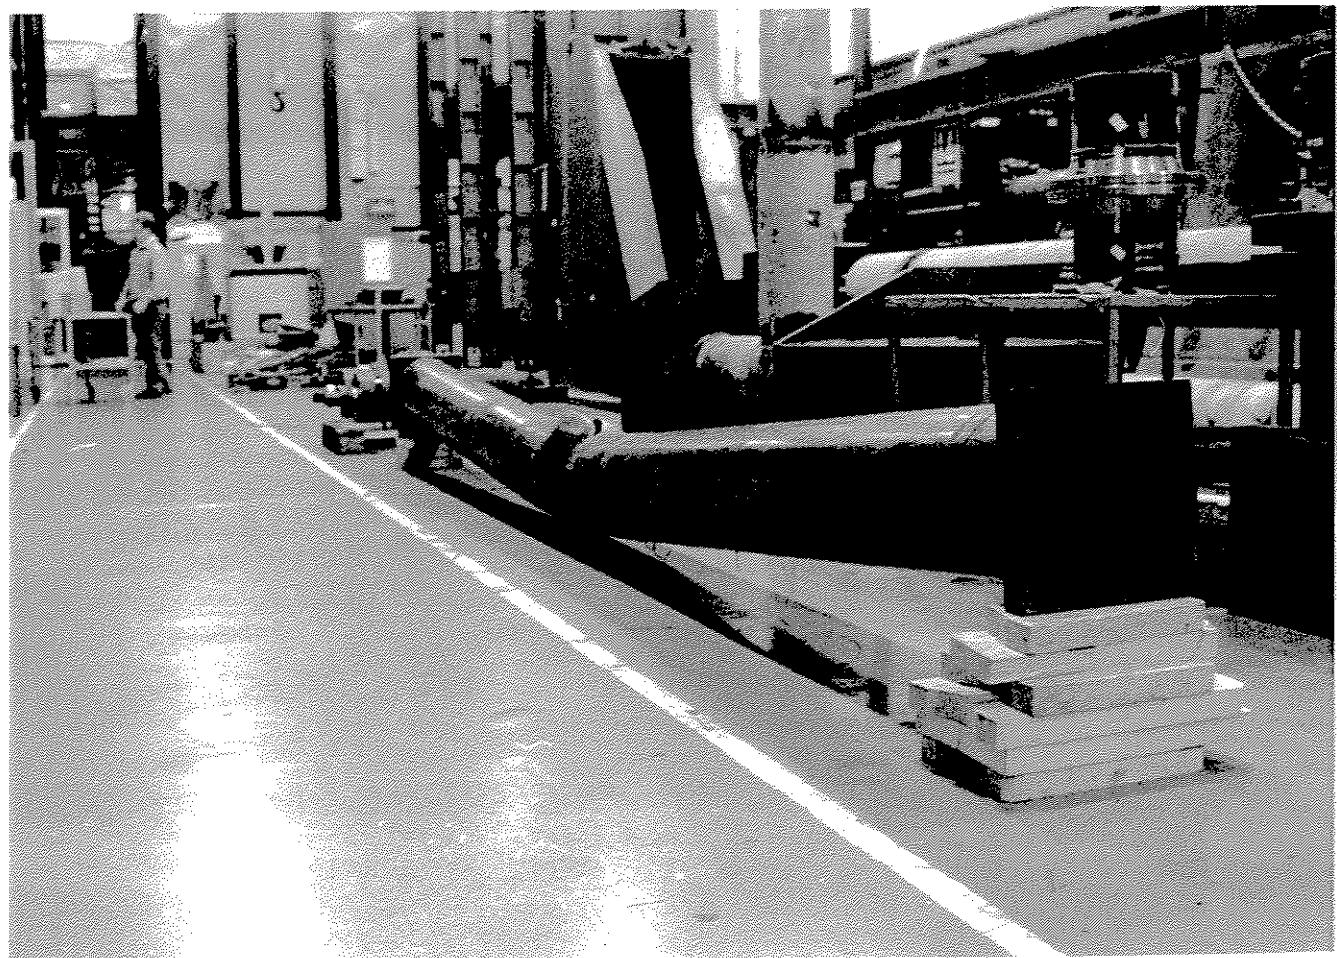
Picture of the test specimen no. 4 after the burst test
